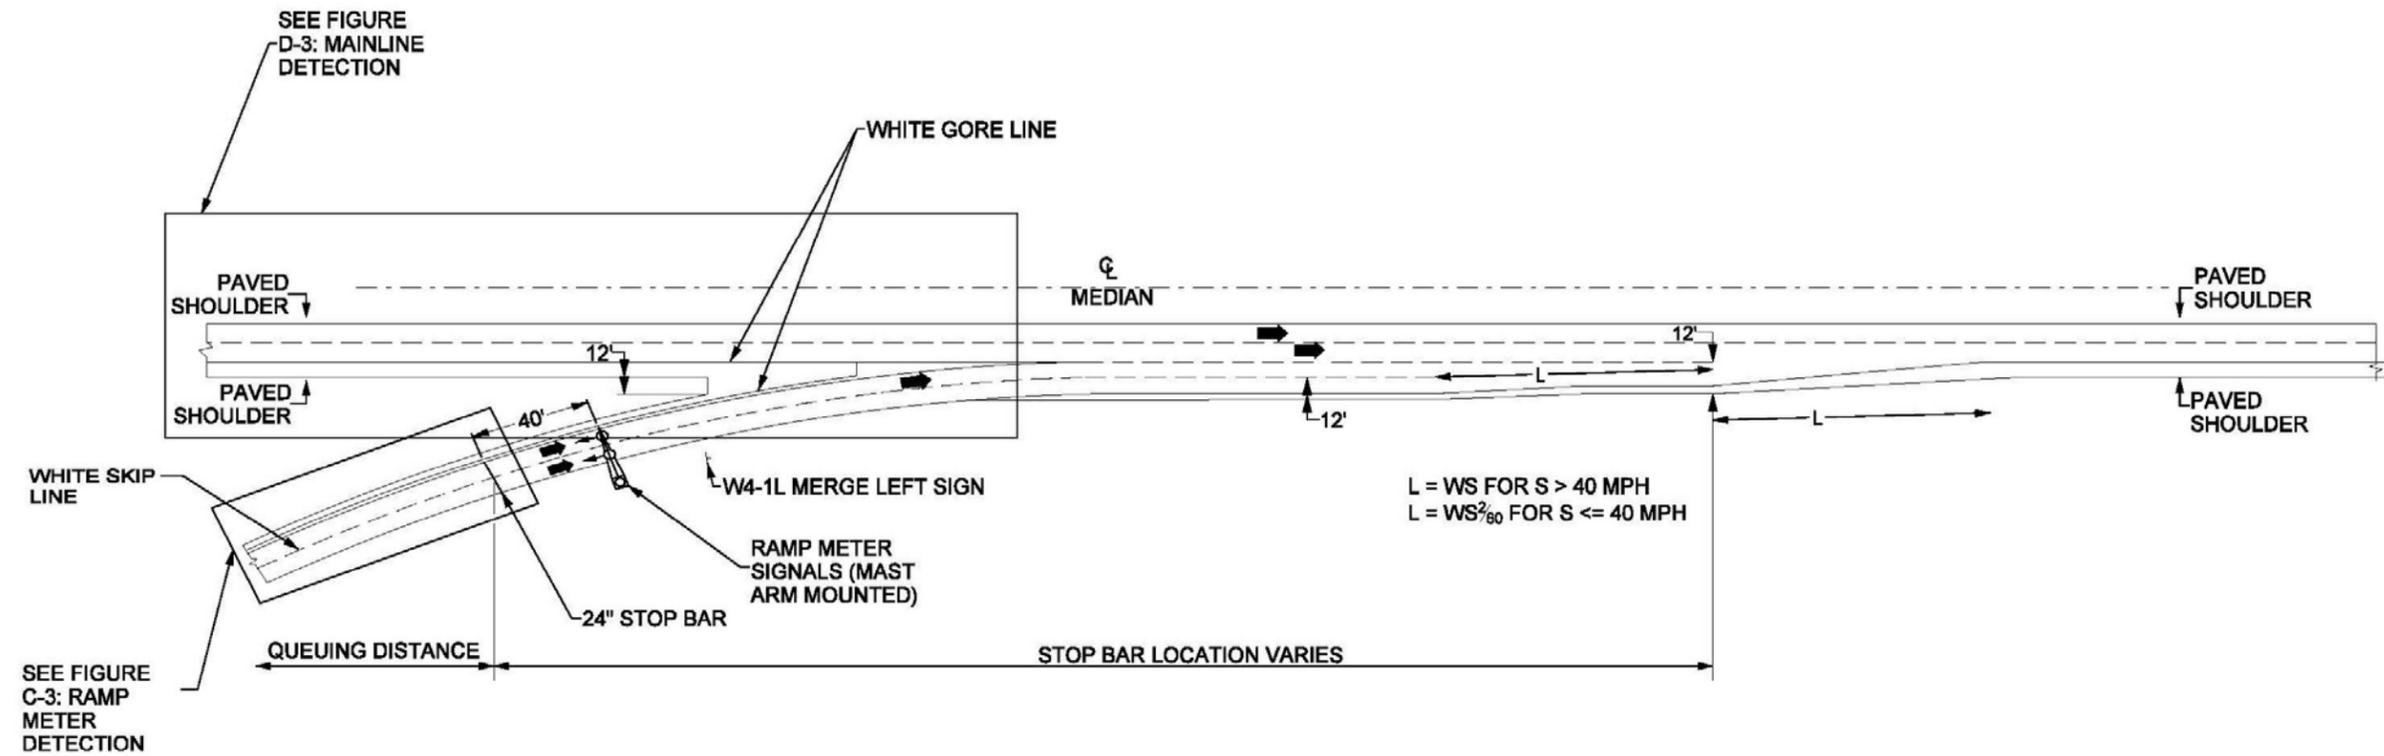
Single Lane Ramp Meter with Transit Bypass Overview
